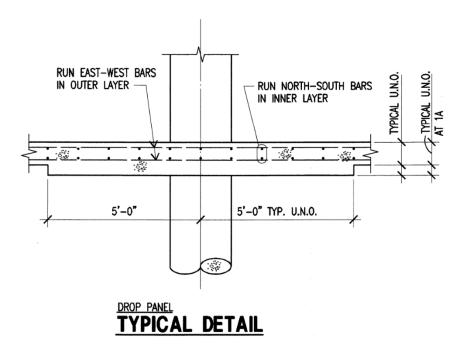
Typical drop panel detail per structural drawings on Sheet S5.1 Detail 1.
